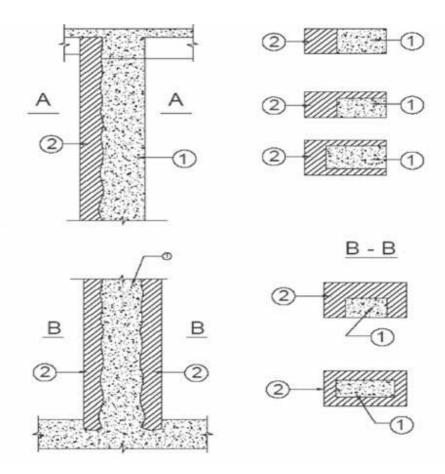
Repair of concrete column by Jacketing (1. Existing column & 2. Jacketing Concrete)
